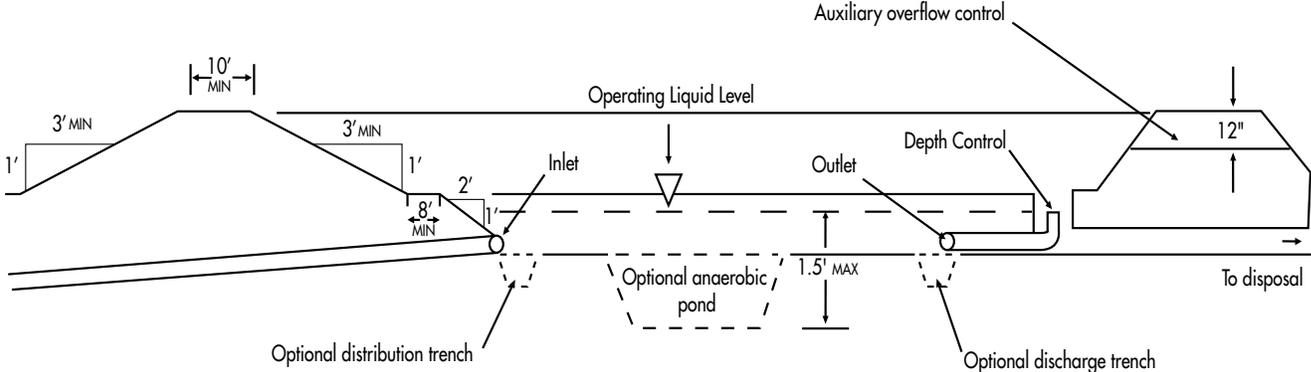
Constructed Wetland Inlet Option Detail (3-dimensional cross section)
